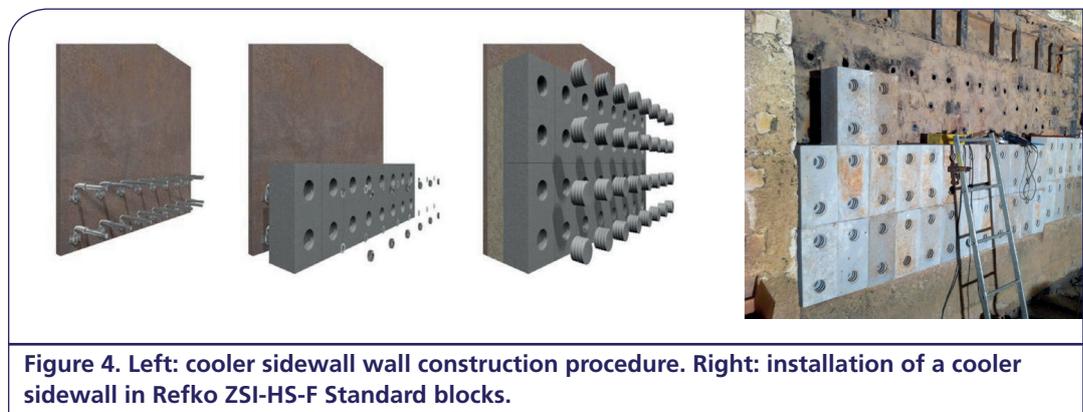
Left: cooler sidewall wall construction procedure. Right: installation of a cooler sidewall in Refko ZSI-HS-F Standard blocks.
